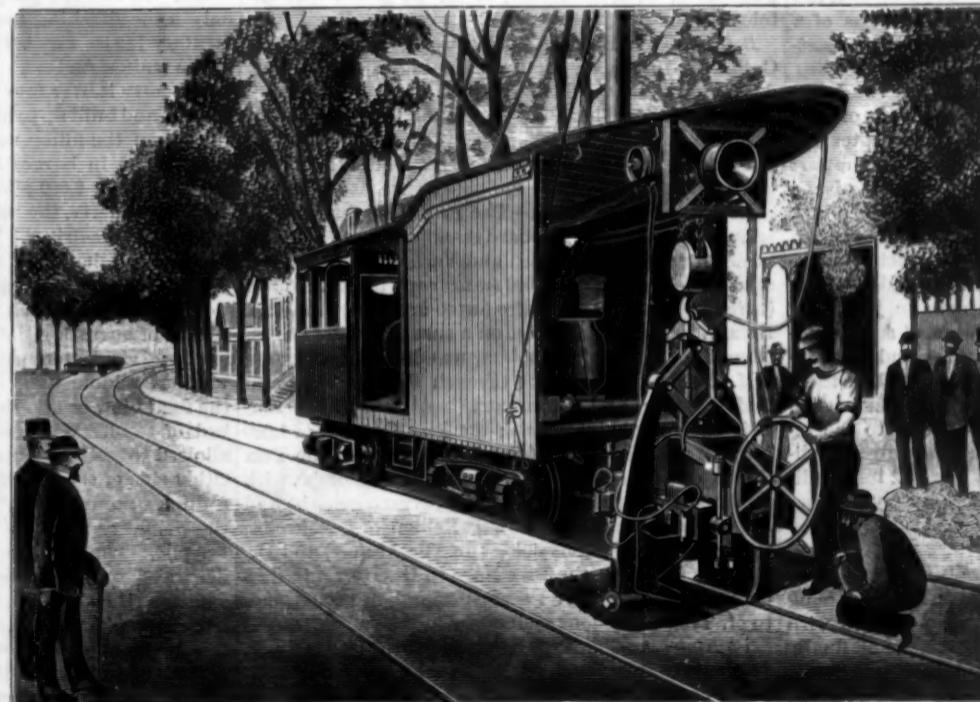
CAR FOR WELDING TRAMWAY RAILS IN PLACE
